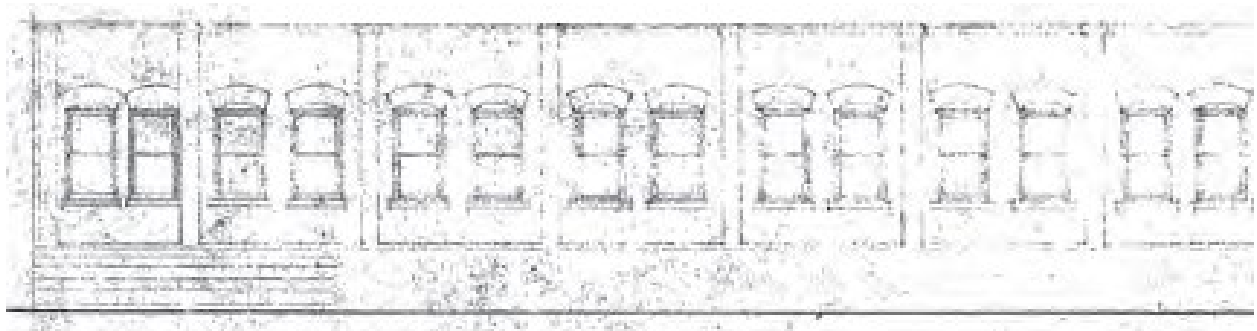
1955 drawing showing the original openings on the 7-bay, east elevation at 340 Dufferin Street. The window openings have since been enlarged and the sixth bay altered to accommodate an entrance from Dufferin Street (City of Toronto Building Records)
